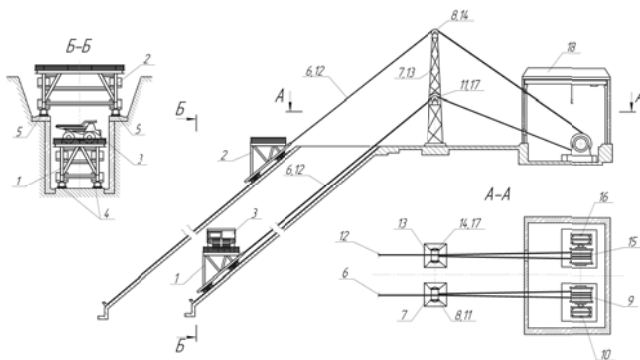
General view of a single-sided hoisting plant in a vertical plane of two parallel tracks
